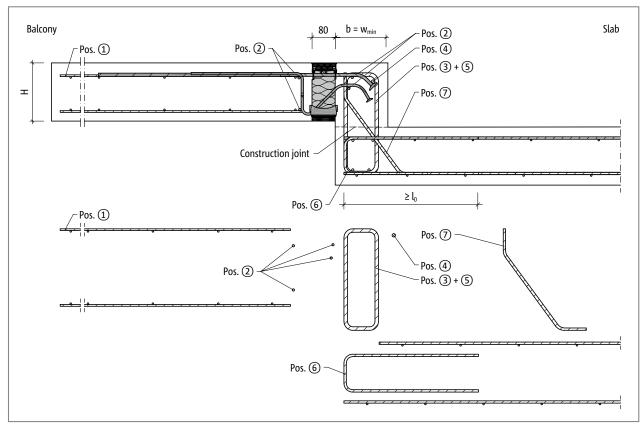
Schöck Isokorb[®] T type K-O: On-site reinforcement for balcony with height offset upwards with minimum structural element dimension (wexist= wmin)
